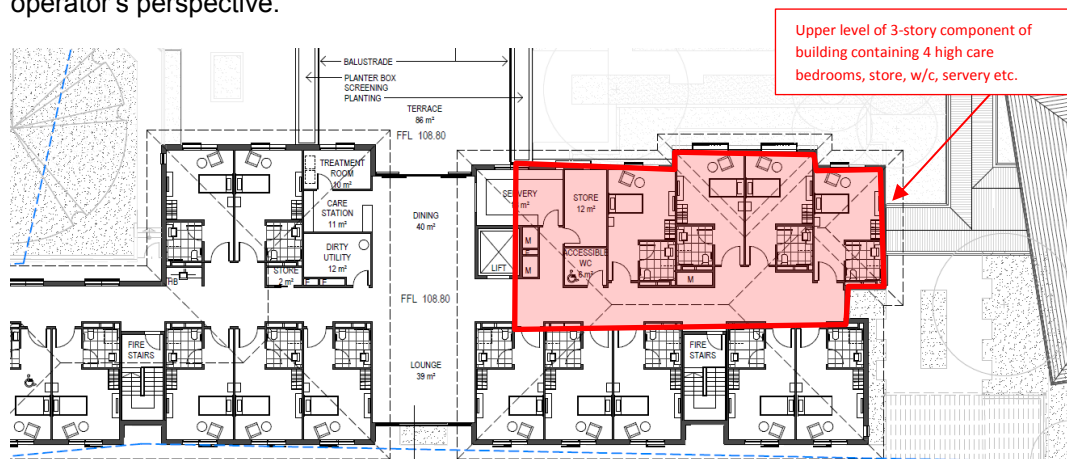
Extract from Level 2 Floor Plan illustrating Ground level of 3-storey component. Source- Group GSA DA-2003
